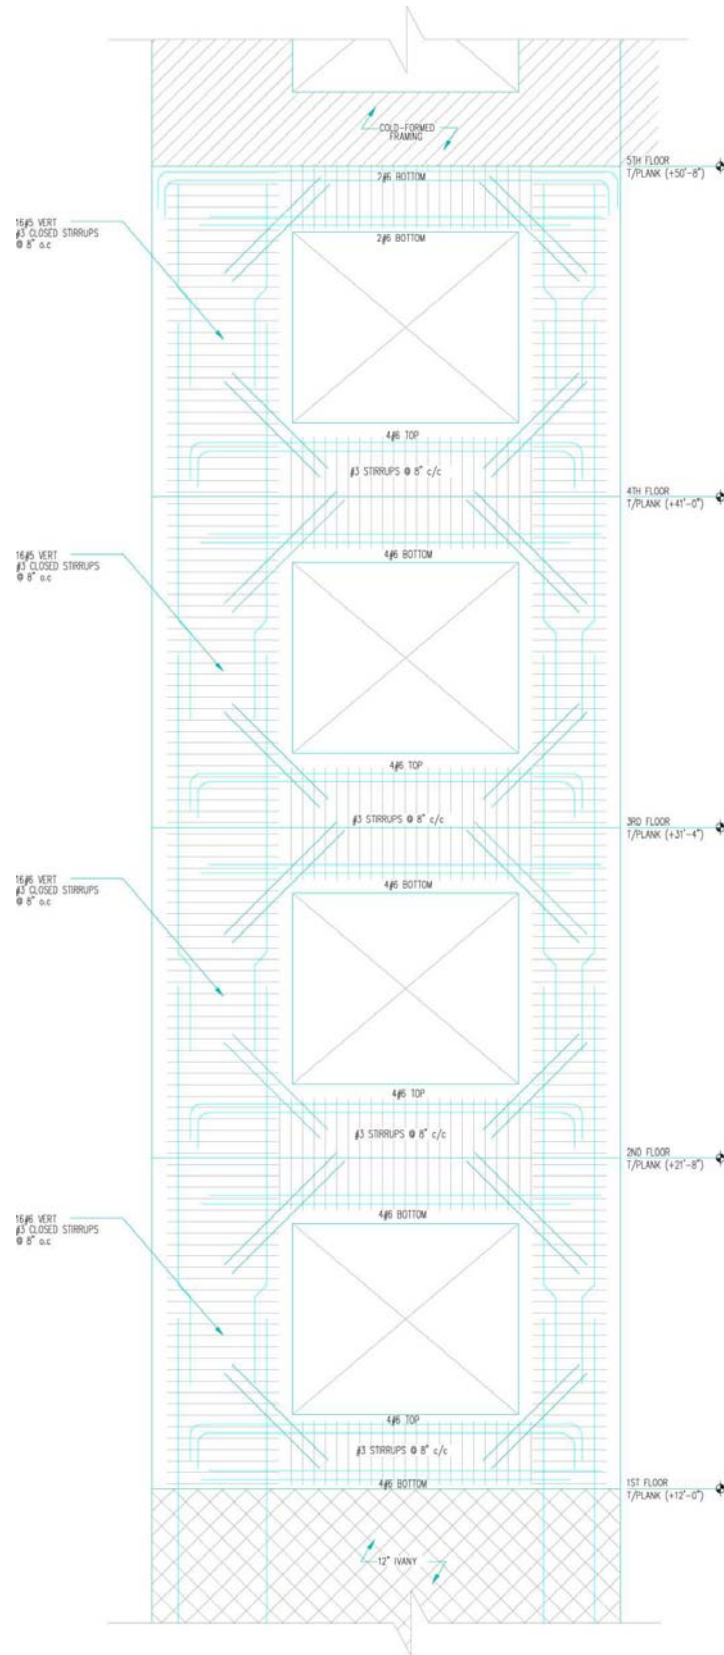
Elevation of 10" Concrete Shear Wall Type 2
